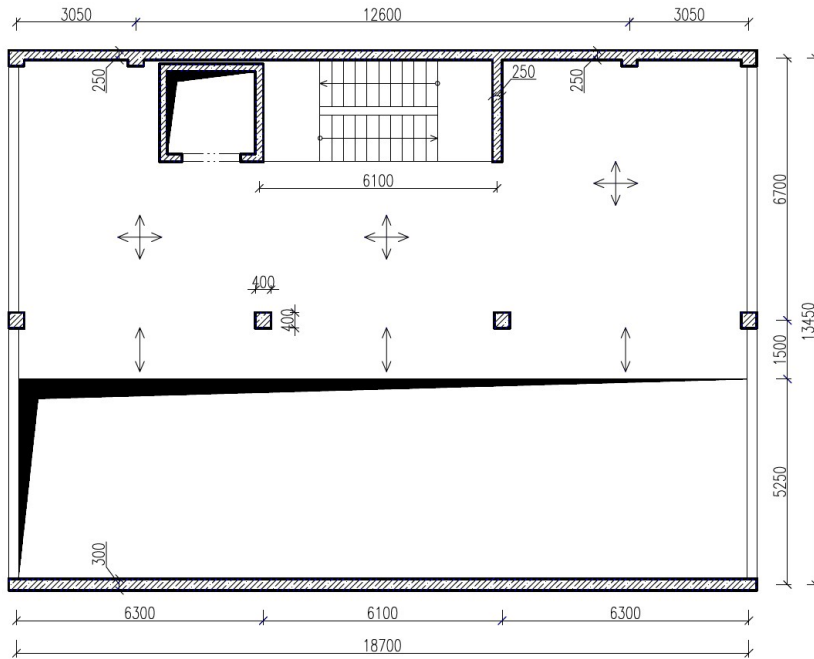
The scheme of a structural system of the 1st, 2nd and 3rd floor of the superstructure
